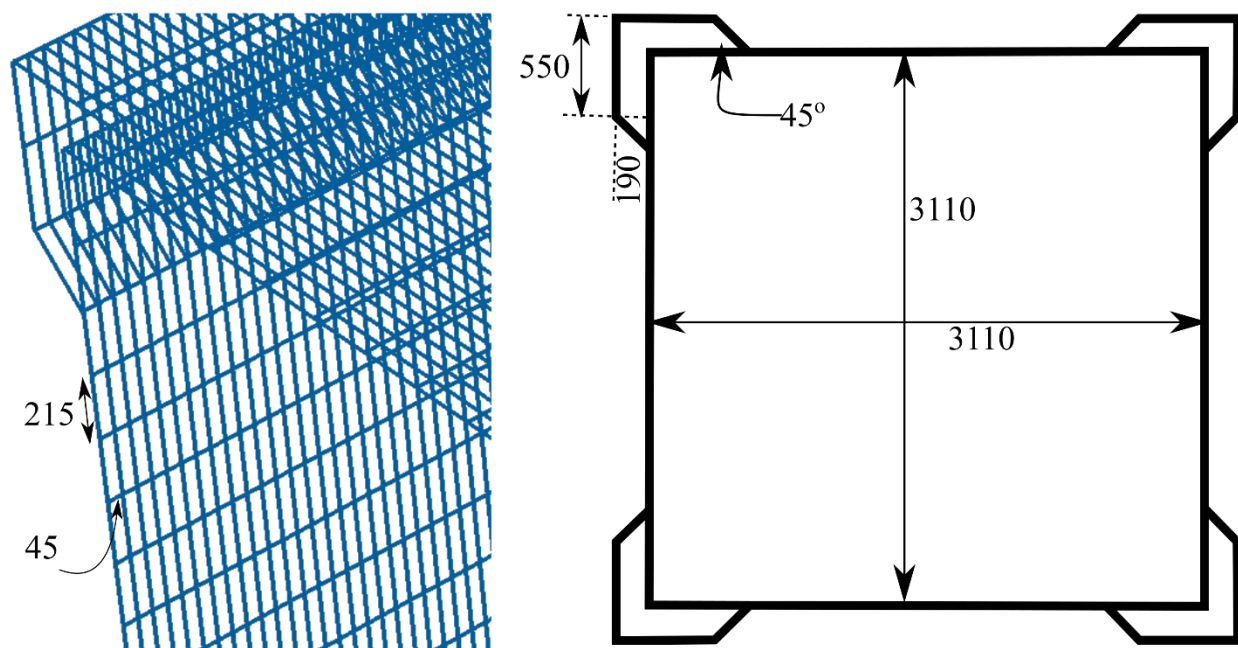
ABAQUS model of the culvert reinforcement cage (all dimensions are in mm)
